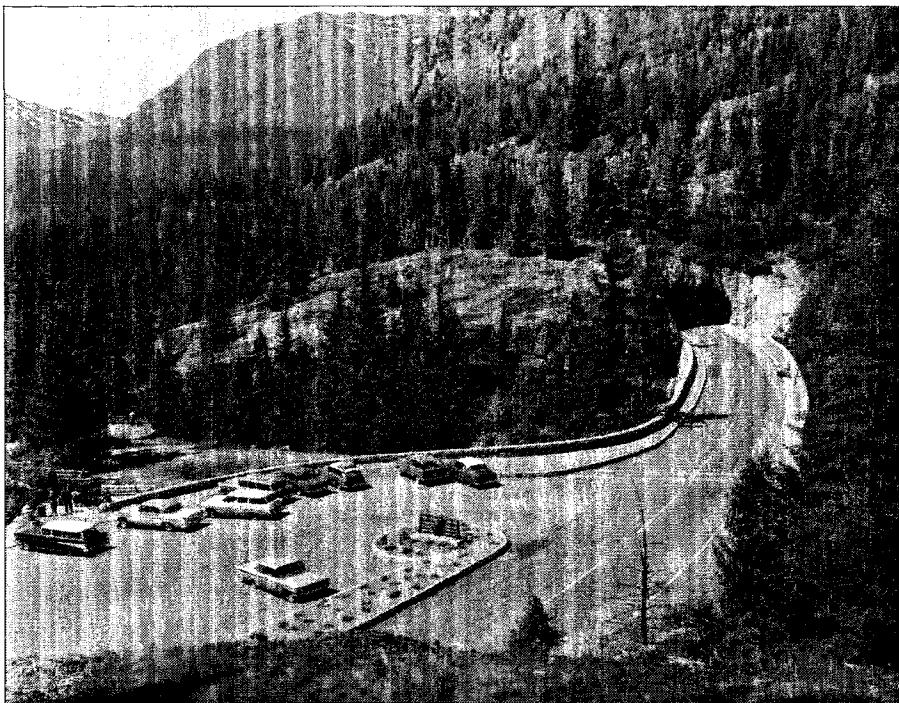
Historic image showing Box Canyon developed area. Note the sign in the island, the Type 1 stone guardwall, sidewalks, and stone curbs, the split rail worm fence and viewing overlook, 1963 (MORA Archive).
